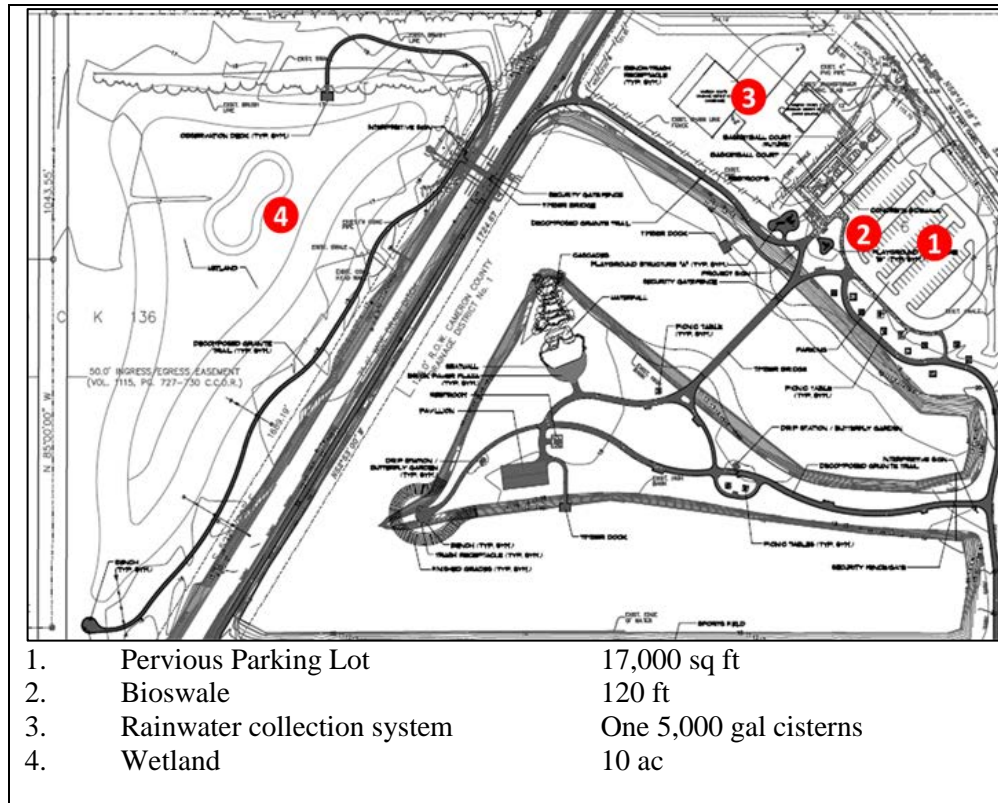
Cascade Park at CCDD#1: BMP layout
